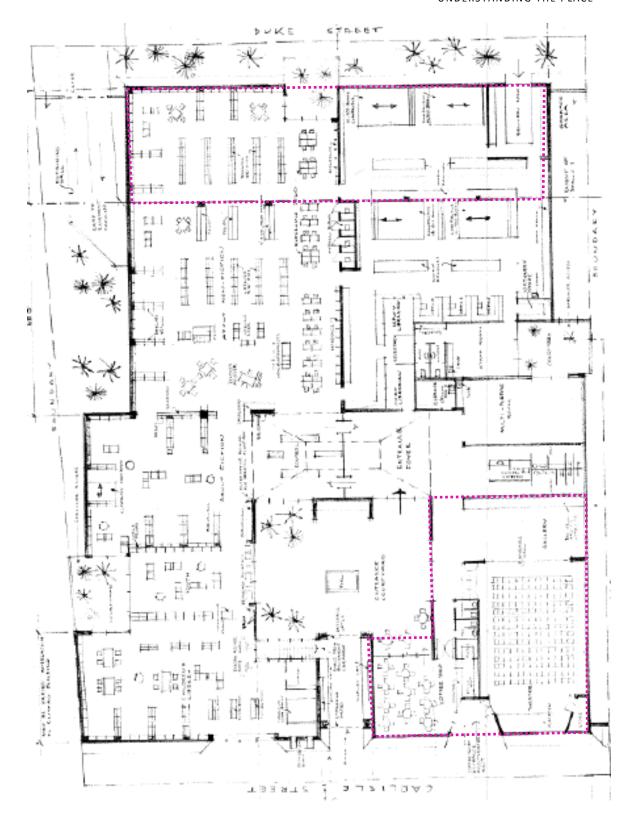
Sketch plan of Stage 2 by Enrico Taglietti, 1971, with the alterations indicated: a theatre and café were proposed at the south-east of the plan and the building was extended to Duke Street: north is at top
